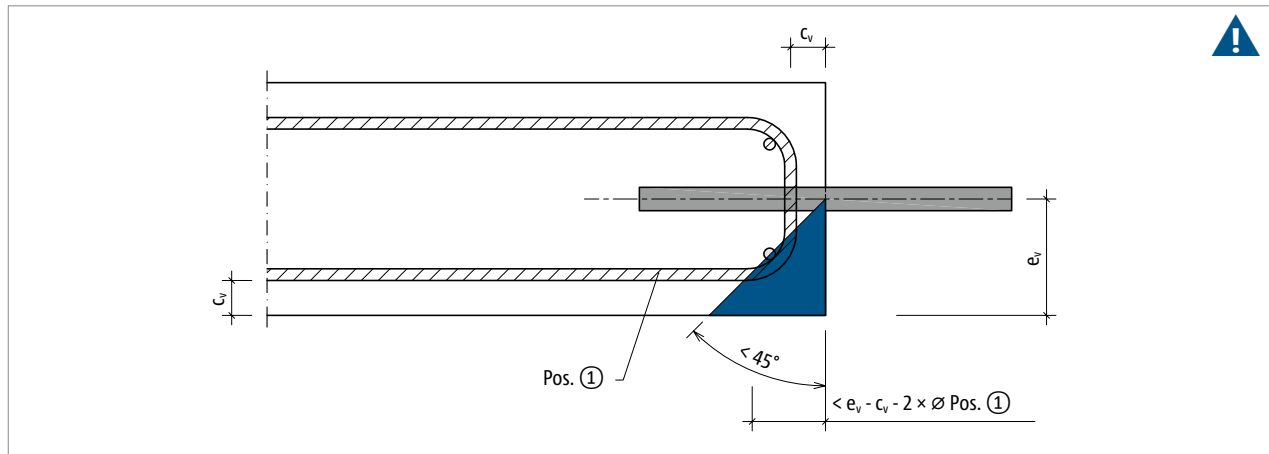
Schöck Stacon® type LD: Position of the longitudinal reinforcement in relation to the front face of the slab
